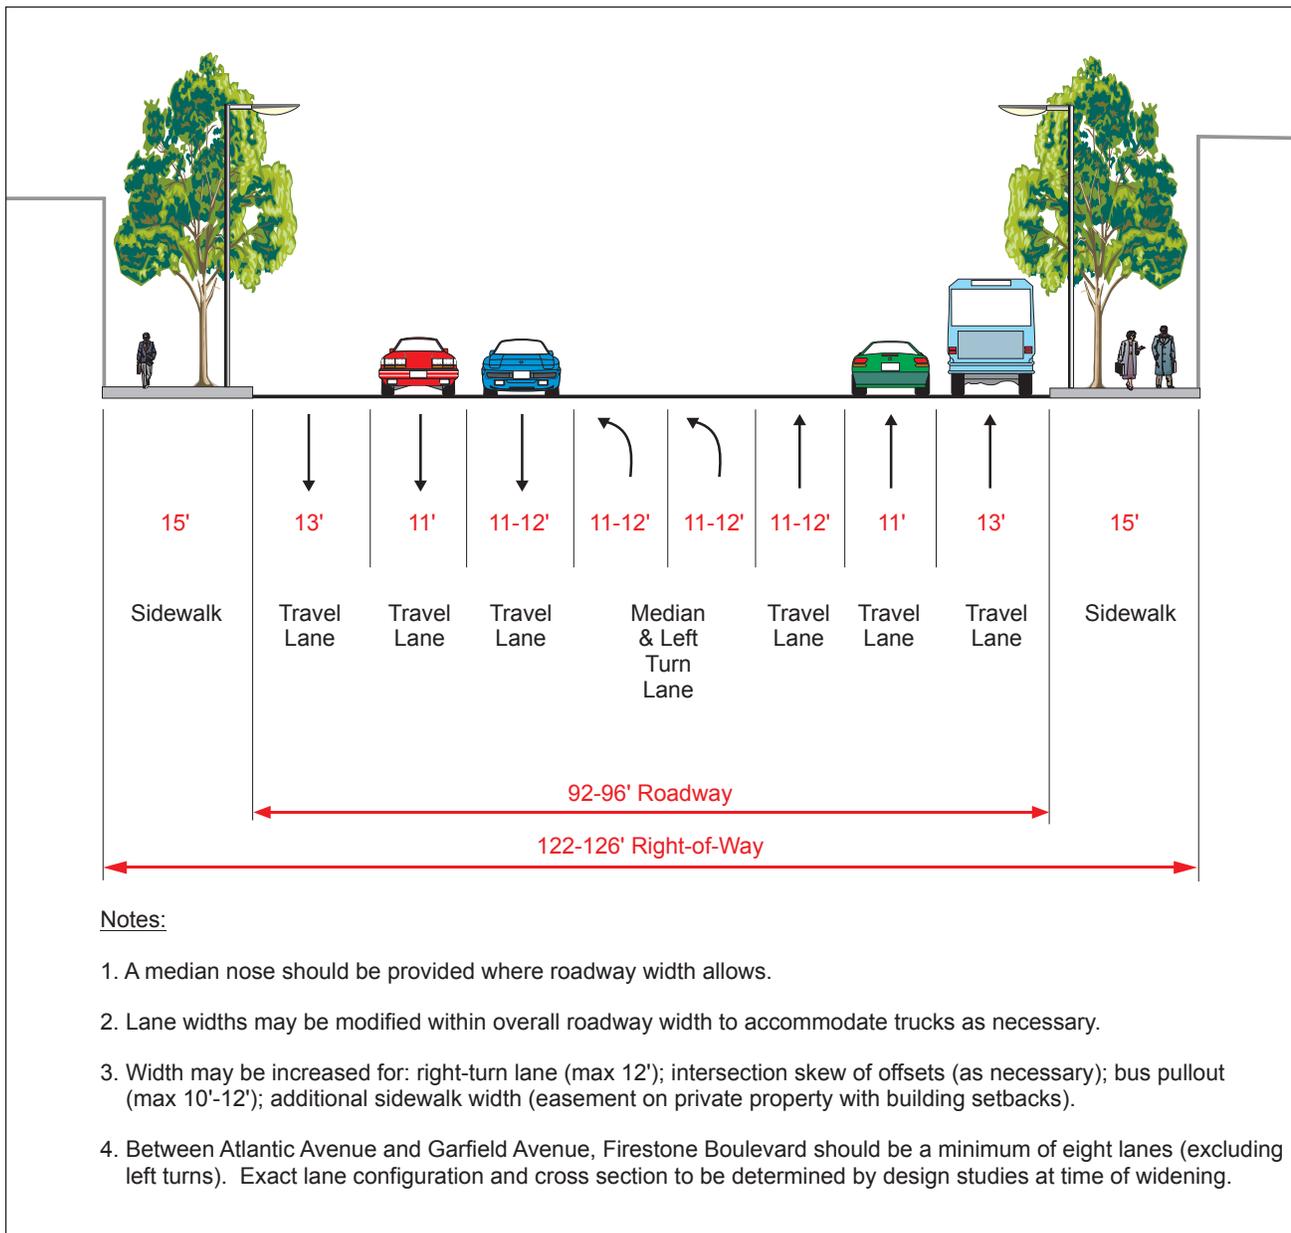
Proposed Street Standard Section for Firestone Boulevard between Evergreen Avenue and Hildreth Avenue.
